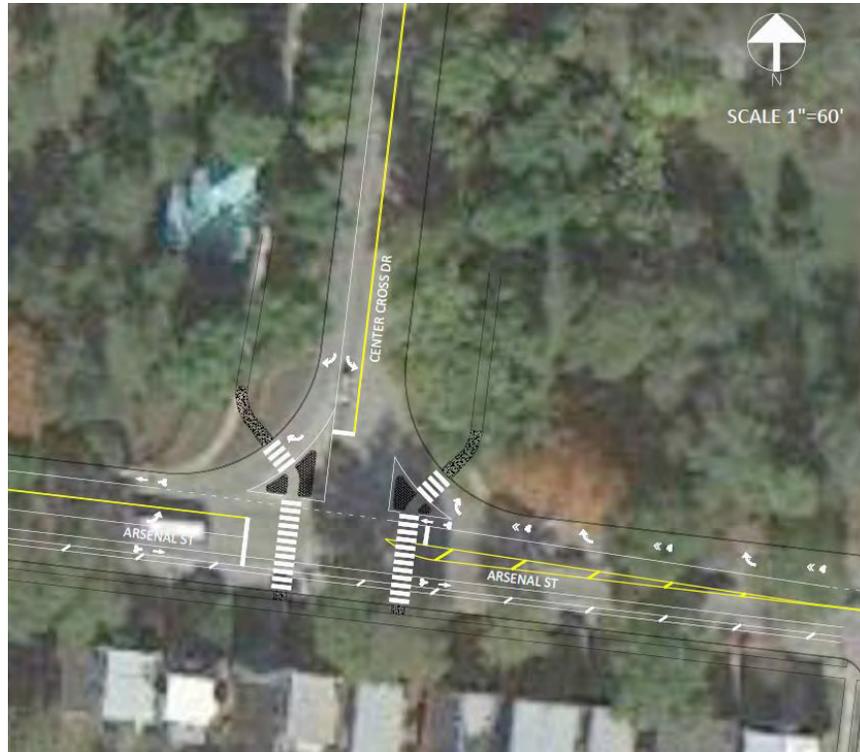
Existing Intersections of Arsenal Street at Center Cross Drive
